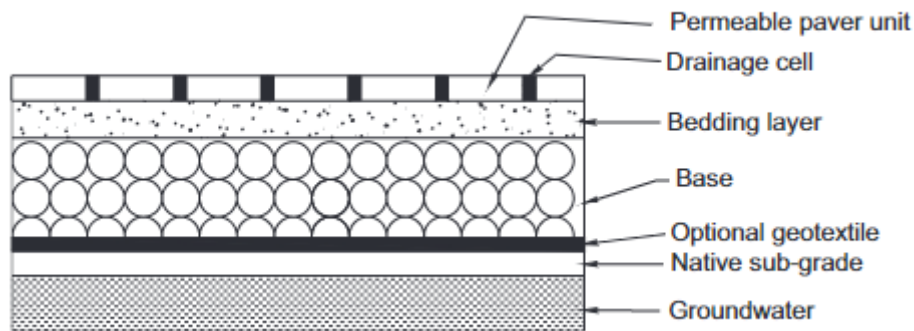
Typical porous pavement (Tota-Mahara et al. 2008)
